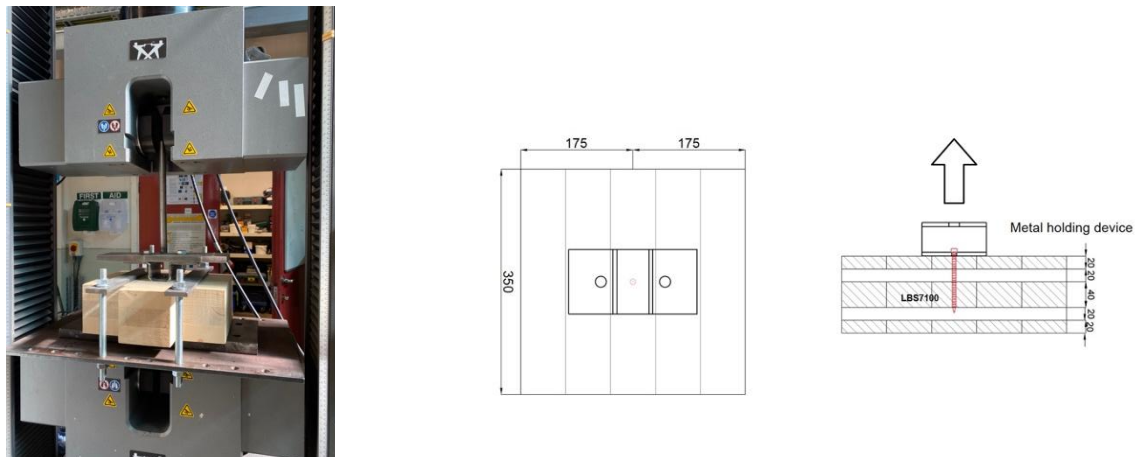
Geometry, cross-section, and details of pull-out test on LBS7100
